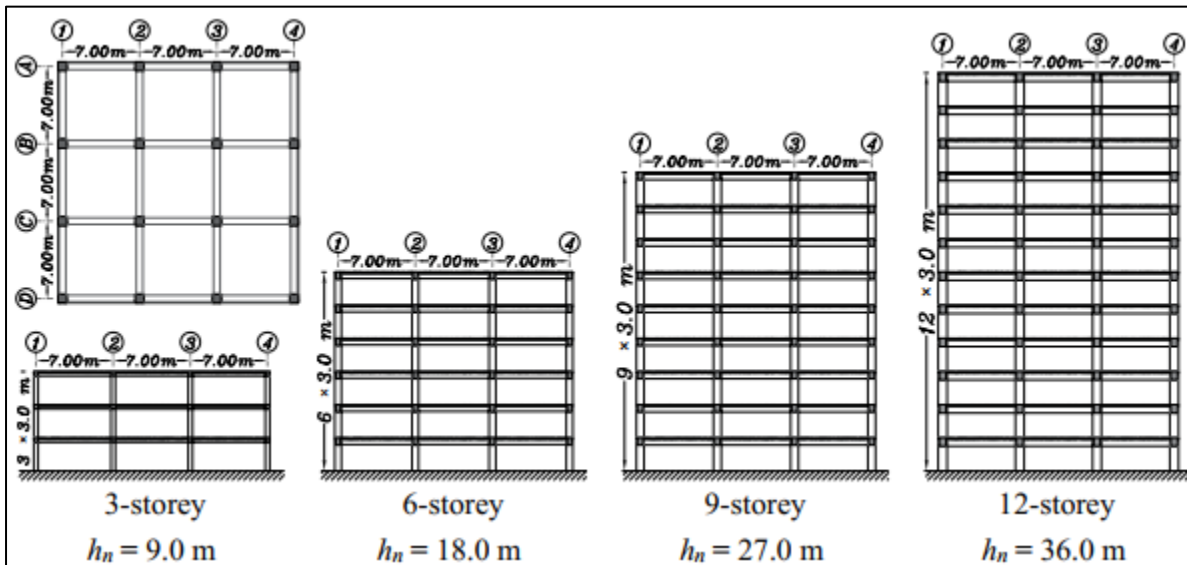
Plan and elevation views of the archetype RC moment-resisting frame buildings used in this study
